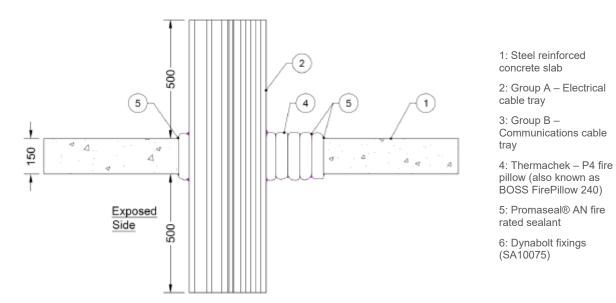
Section A-A of tested system in EWFA 39693400.1 with Thermacheck fire pillow (also known as BOSS FirePillow 240) arranged longitudinally protecting Group A and Group B cable penetrations
